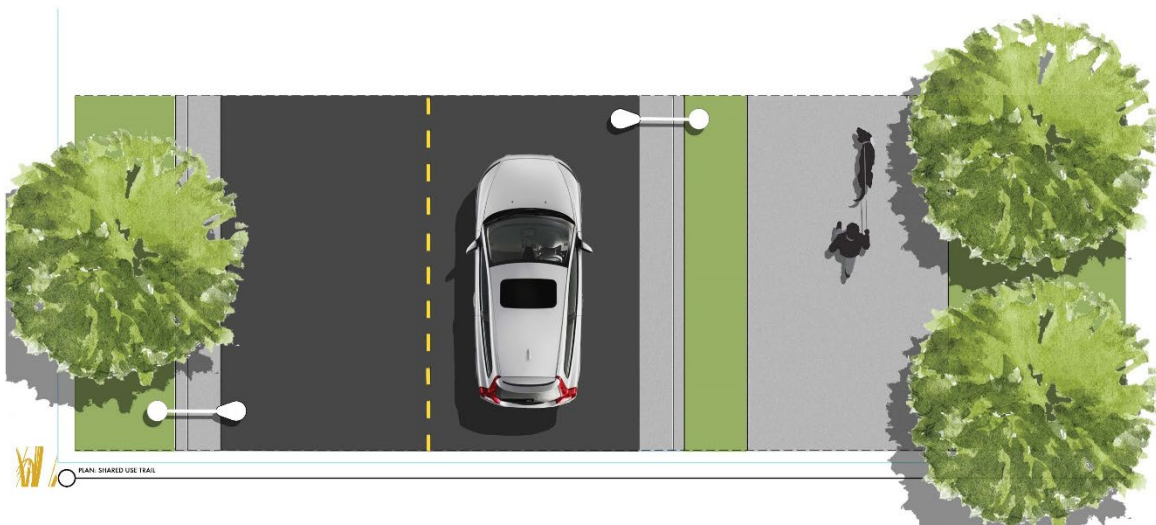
Shared use trail adjacent to street with 4-ft separation (Tallgrass Landscape Arch.).
